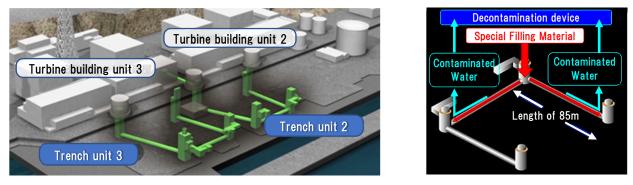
Structure of seawater piping trench (left) and remediation plan for contaminated water (right)
